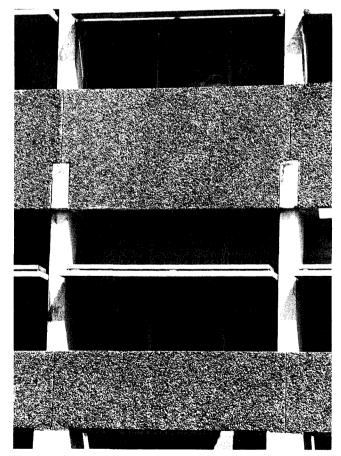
Exposed aggregate finish on the second administration building, U.S.T., Kumasi. Architects: GERLACH & GILLIES REYBURN.
